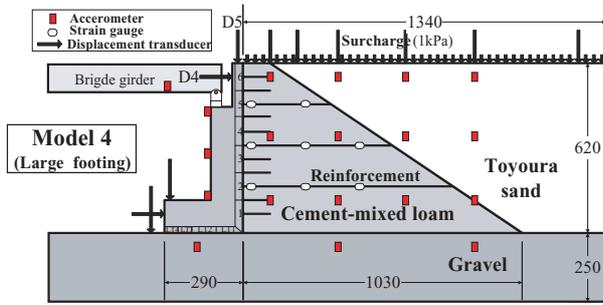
Cross-sections of reinforced abutment with cement treated backfill (Model 4)
